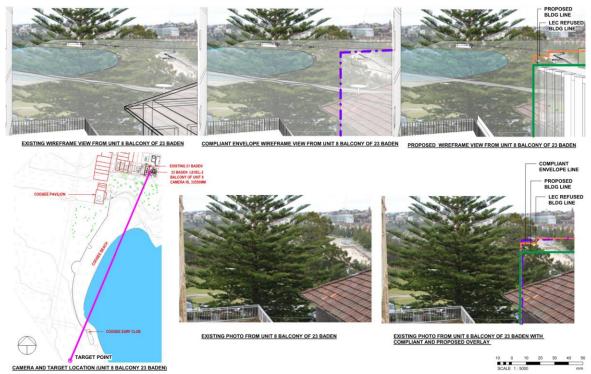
View analysis – 8/23 Baden St balcony (Source: Legge & Legge Architects)
